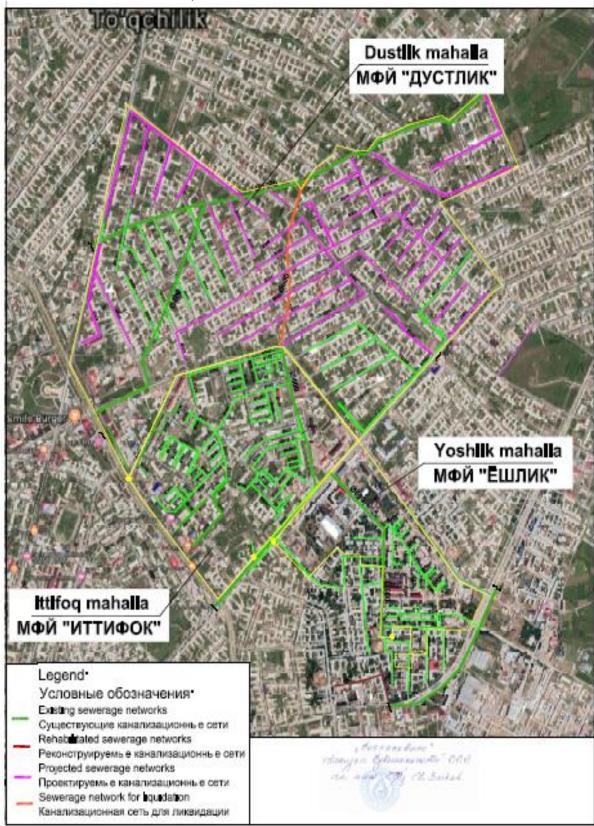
Sewerage networks rehabilitation and construction layout for Ittifok, Dostlik and Yoshlik mahallas
